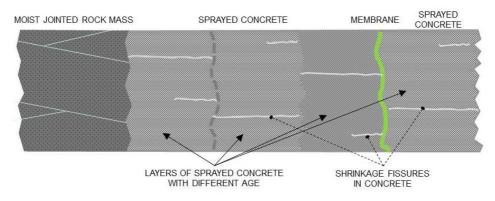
Conceptual diagram with section of SCL lining structure with main materials
